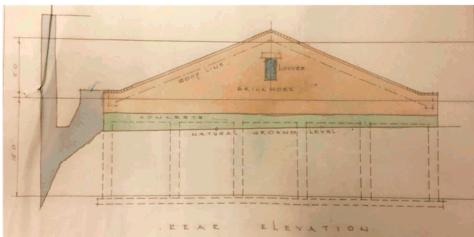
Rear, north western elevation on boundary with 144-160 Murray Street. Note the level of the natural ground level. Excavations in the order of some 3.3 m were required at this end of the site (TAHO, $AE_{417}/1/2_{108}$, 125 Bathurst Street (6871).
